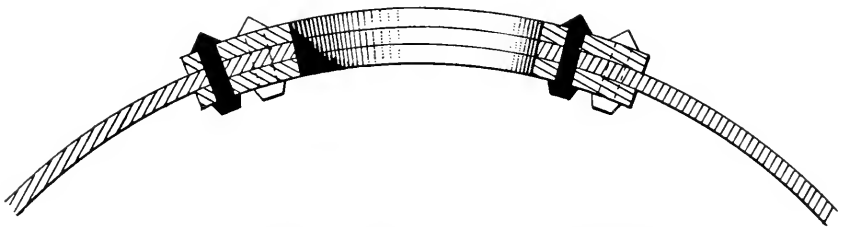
SECTIONAL VIEW OF RING, BEFORE FAILURE.
